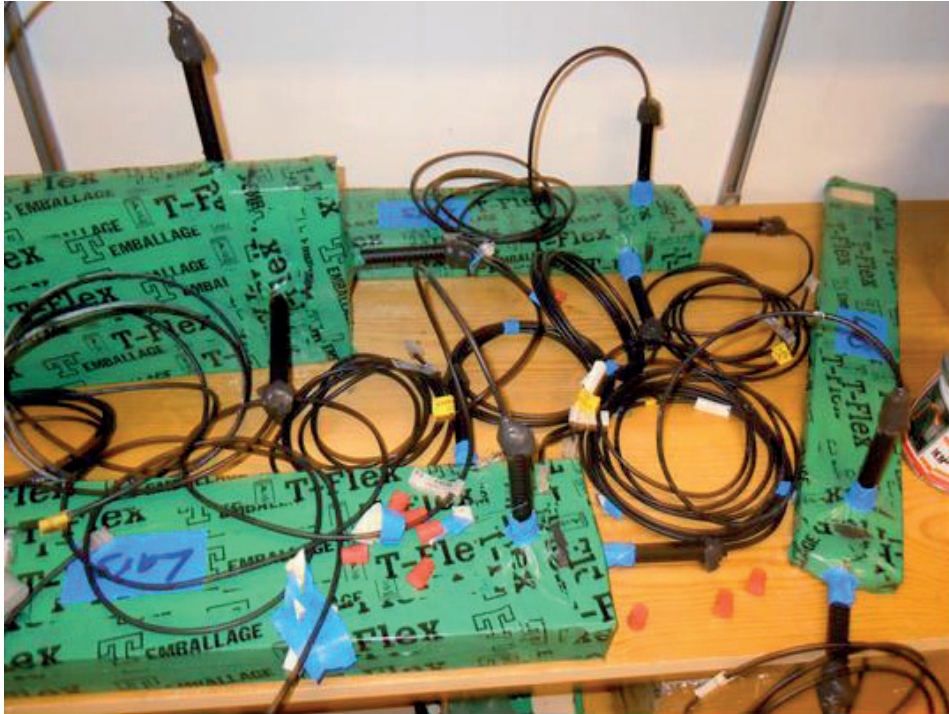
Sealed specimens with measuring tubes, 12 mm inner diameter, assembled on surfaces and in the centre as well as an installed RH sensor.
